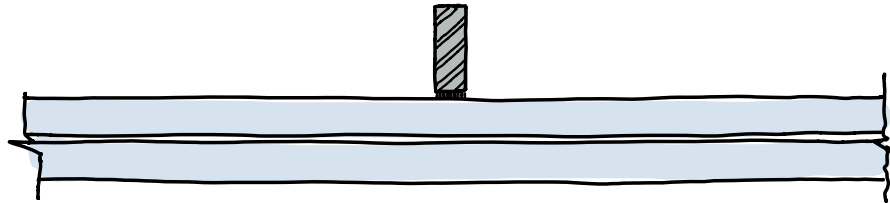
Typically glass structures consist of many layers of glass, connected with opaque fittings that transfer the load.
